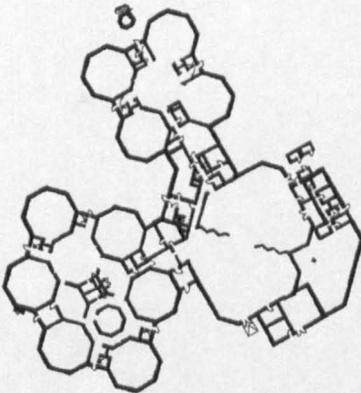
Ground floor plan of Andrew Ewing primary school (left)
